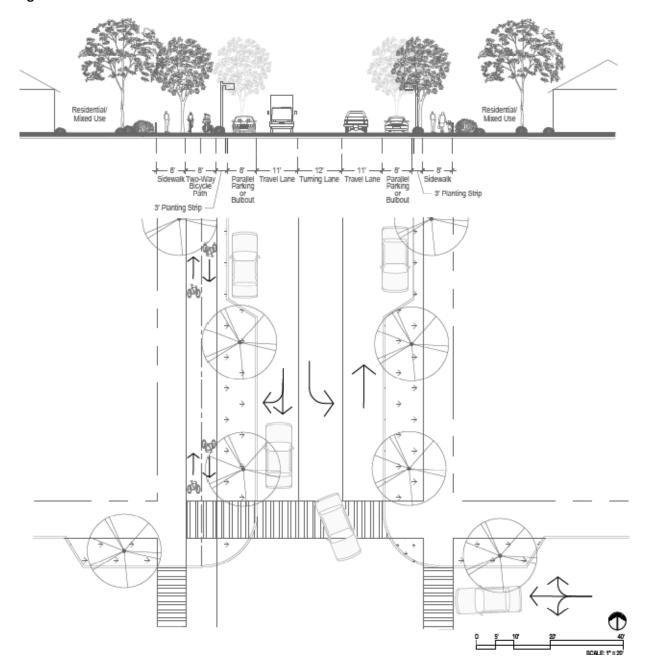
Avenue 12 Cross-Section off Downtown Area
